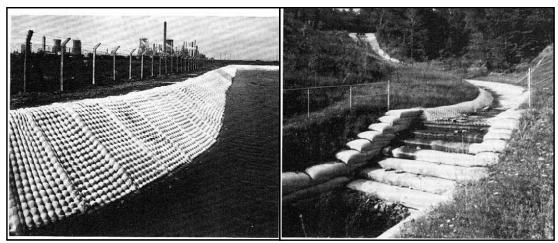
Fabric forms for concrete (B. A. Lamberton, Concrete International, 1989 Vol. 11).
